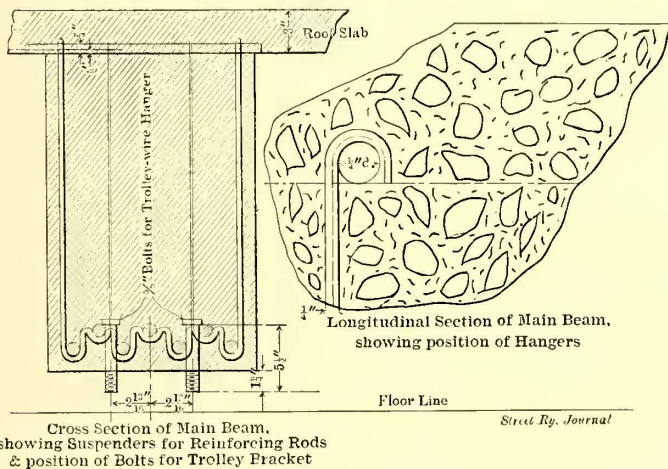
SOME DETAIL WORK IN THE CENTRAL PENNSYLVANIA TRACTION COMPANY'S NEW CAR HOUSES
